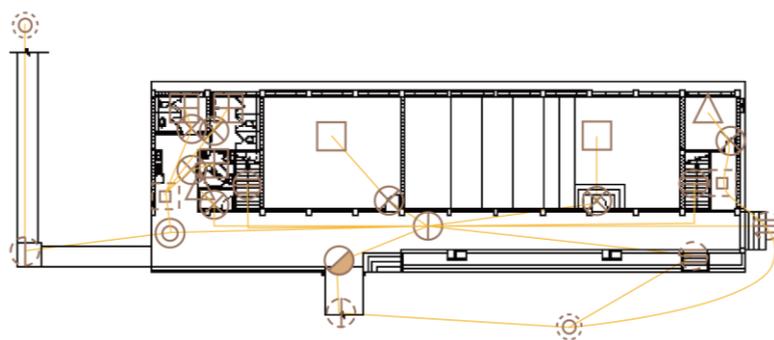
1st floor plan of Che Cheng Elementary School in Taiwan
